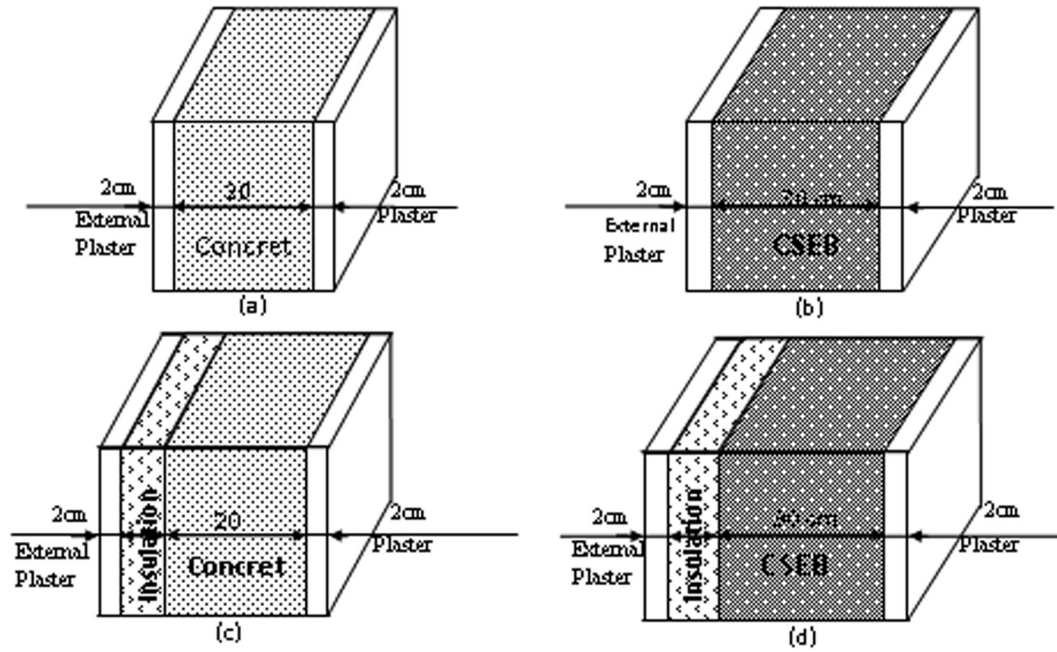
Typical wall structures (a: hollow concrete block wall, b: CSEB wall) and proposed wall structures (c: insulated hollow concrete block wall, d: insulated CSEB wall).
